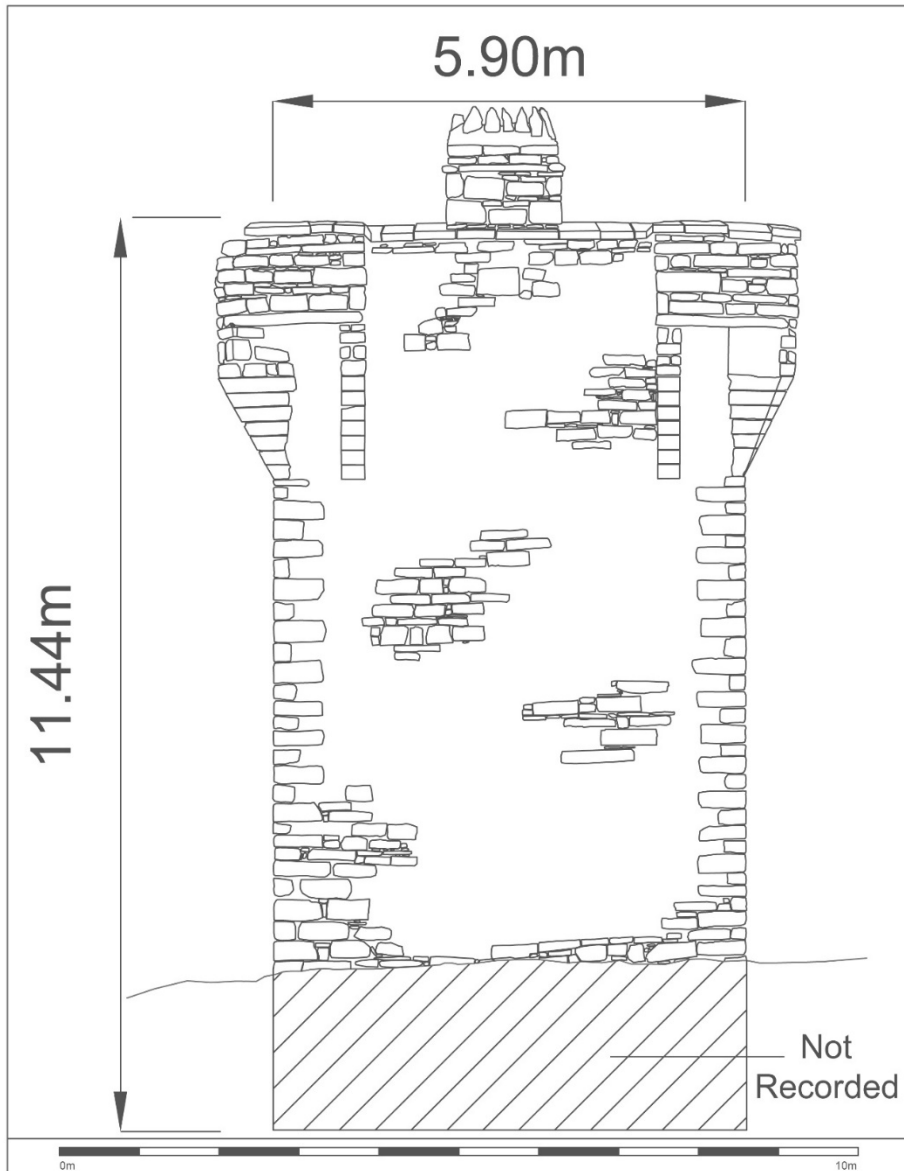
External elevation of the north-east wall of the signal tower at Carrigan Head Signal Station.
